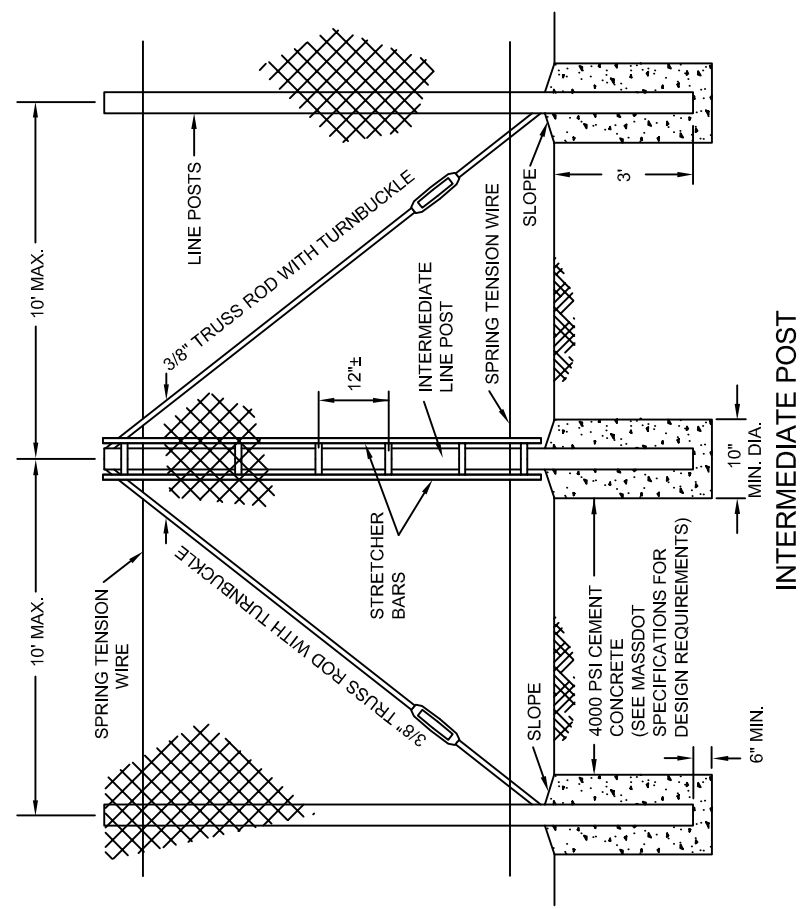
DETAIL SHOWING LINE POST SET IN CONCRETE FOOTING FOR DIMENSIONS SEE 404.5.0
